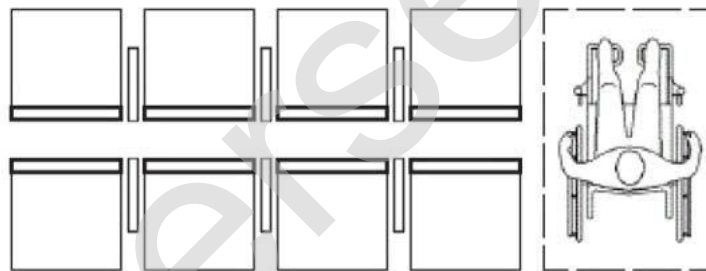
FIGURE: BARRIER FREE DESIGNATED WAITING AREA WITH FIXED SEATING DESIGN REQUIREMENTS
